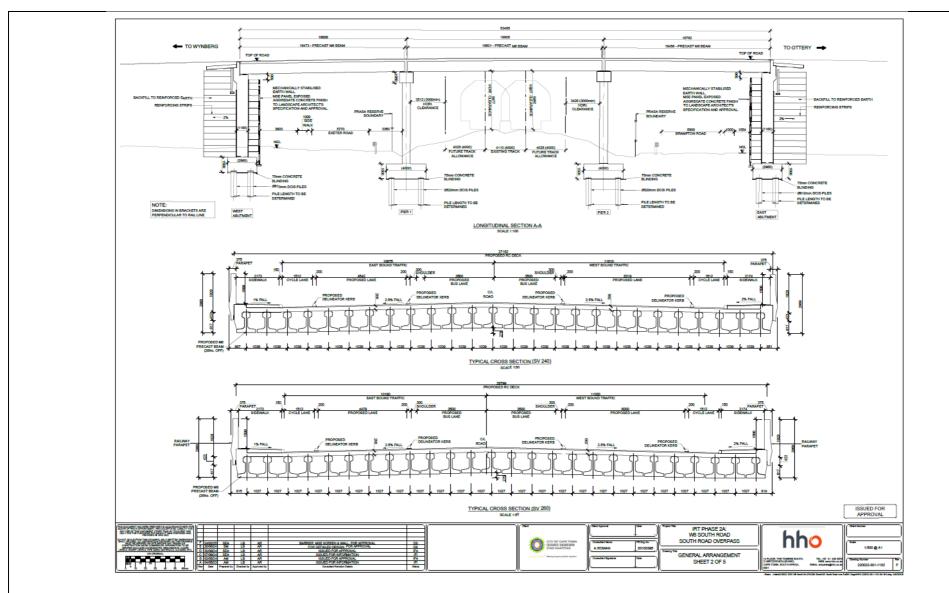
Typical cross section for bridge structure (rail overpass) (source: HHO, 2025)
